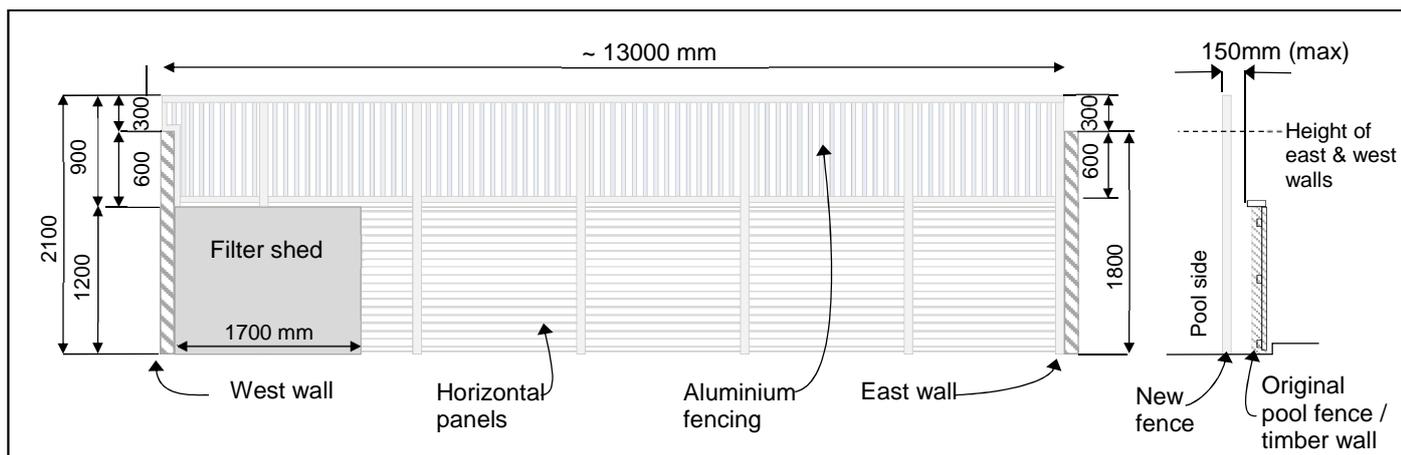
Sketch of the pool barrier north elevation (not to scale)
